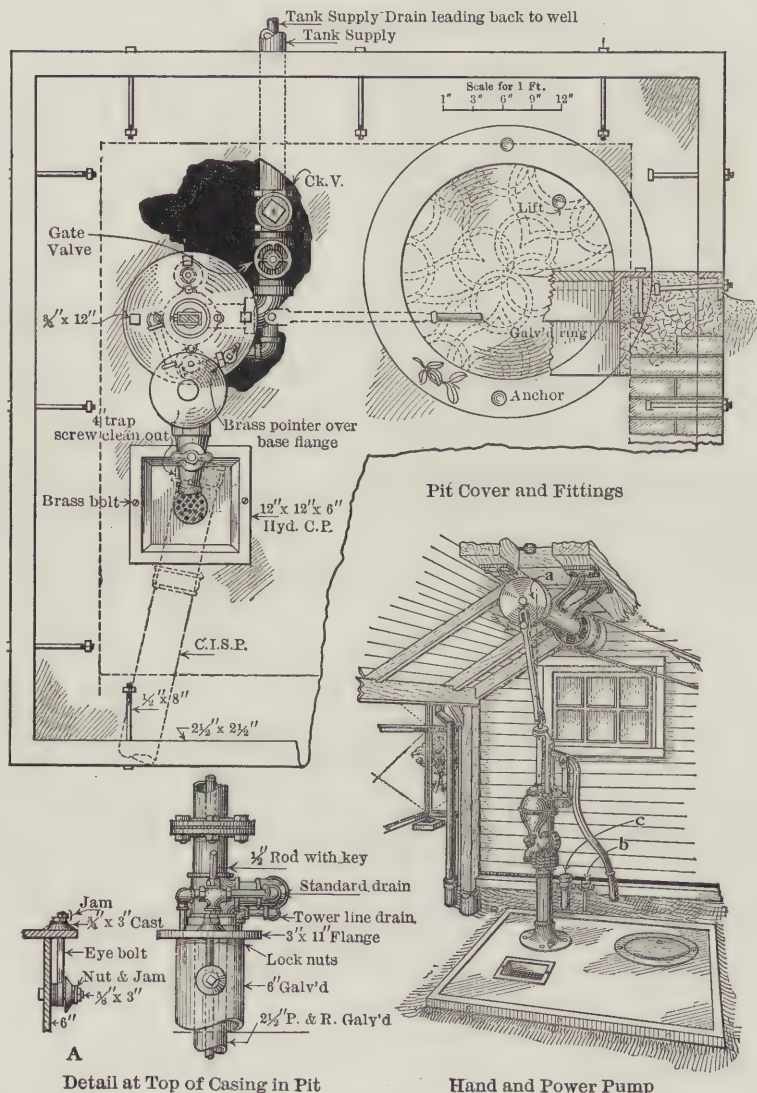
INSTALLATION OF A HAND AND POWER PUMP OUTFIT
